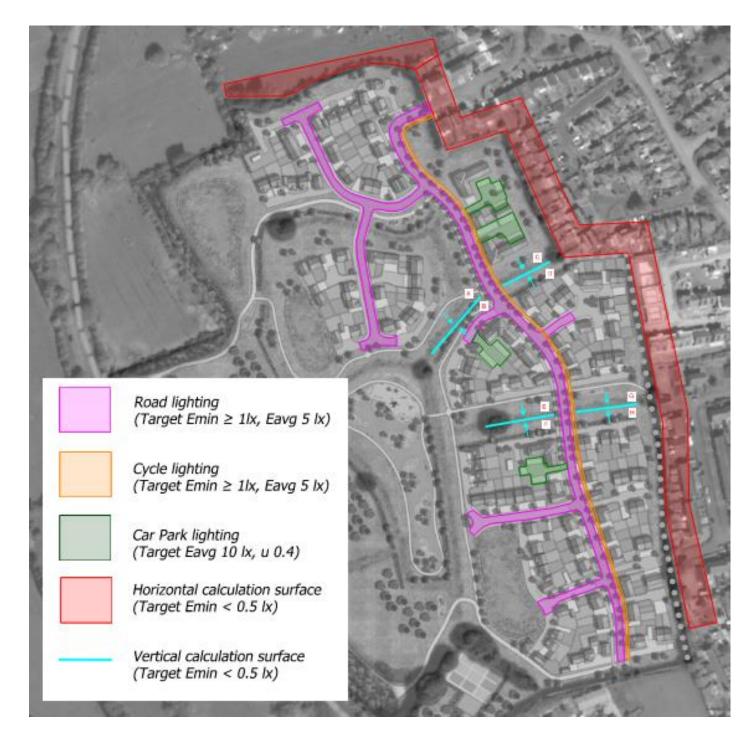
Plan view of proposed site layout, with Rectory Farm to the south
